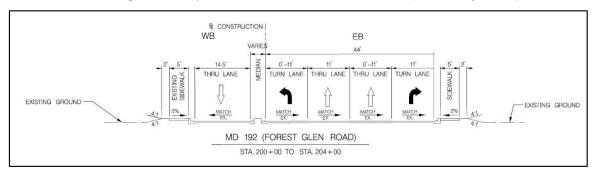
Proposed Cross Section – Forest Glen Road/MD 192 (West Side of MD 97)
